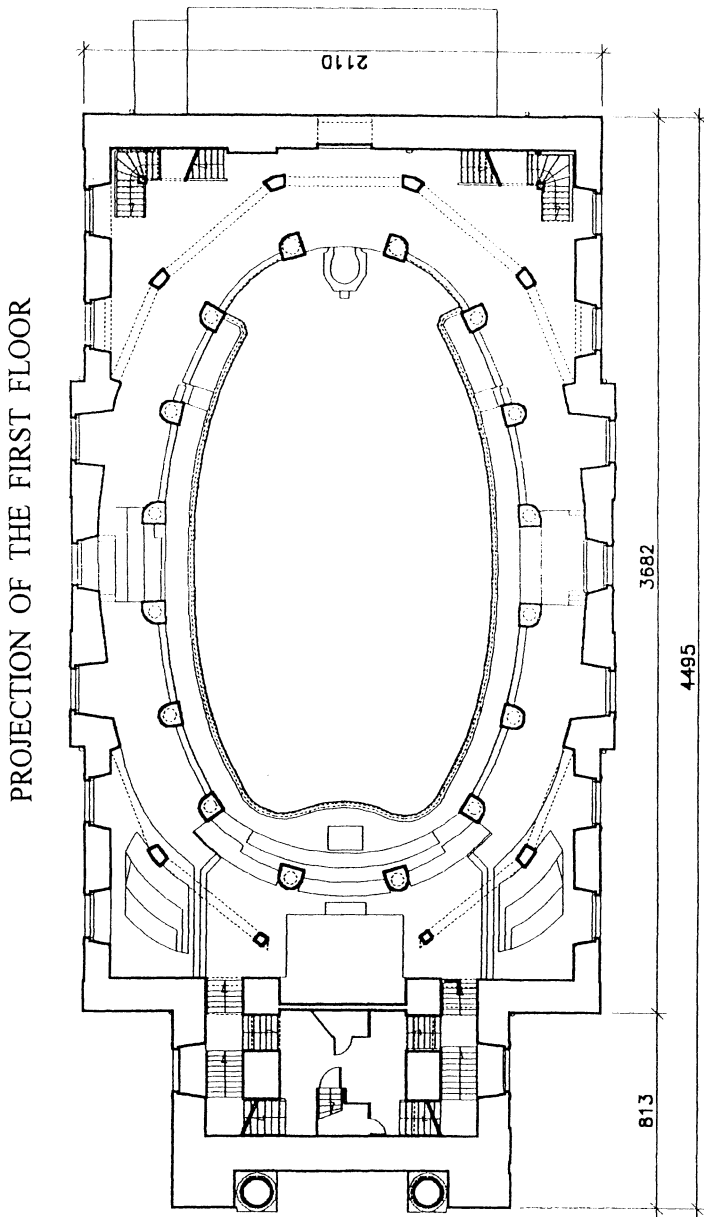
Shape and overall dimensions of horizontal projection of the church.
